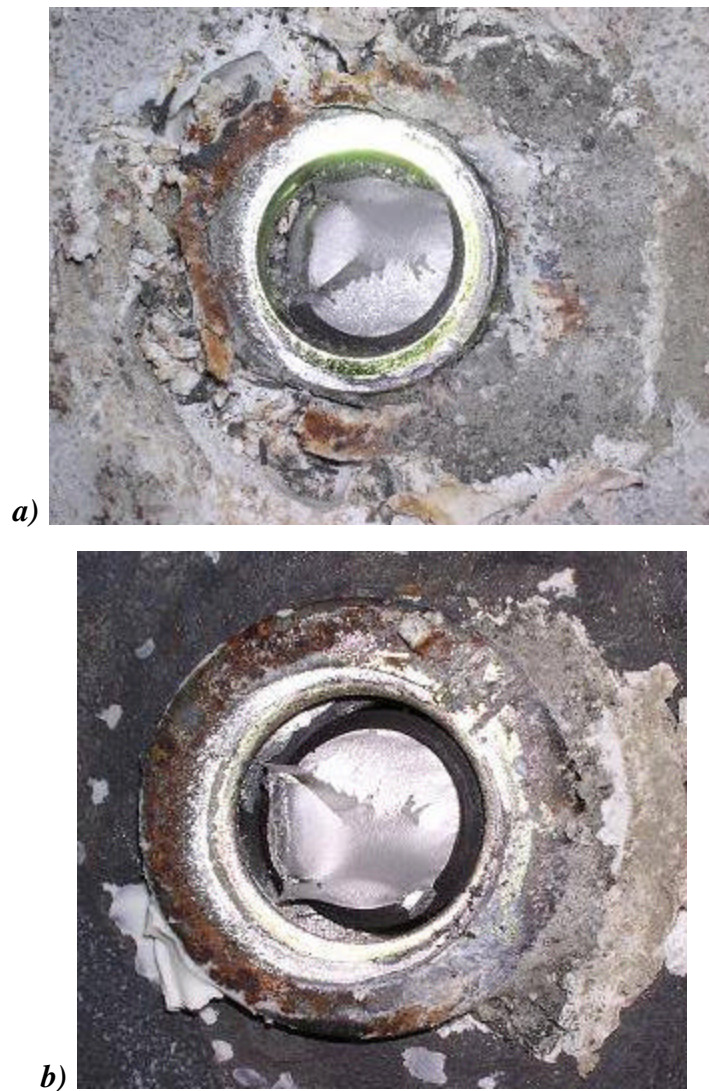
Failed Specimen DBLNB40: a) concrete block, b) steel plate
